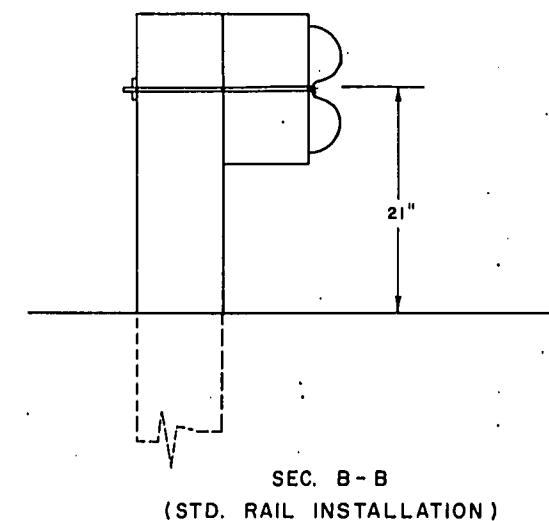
### DETAIL AT STRUCTURES WHERE BRIDGE DECKS ARE TO BE REPLACED IN FUTURE
